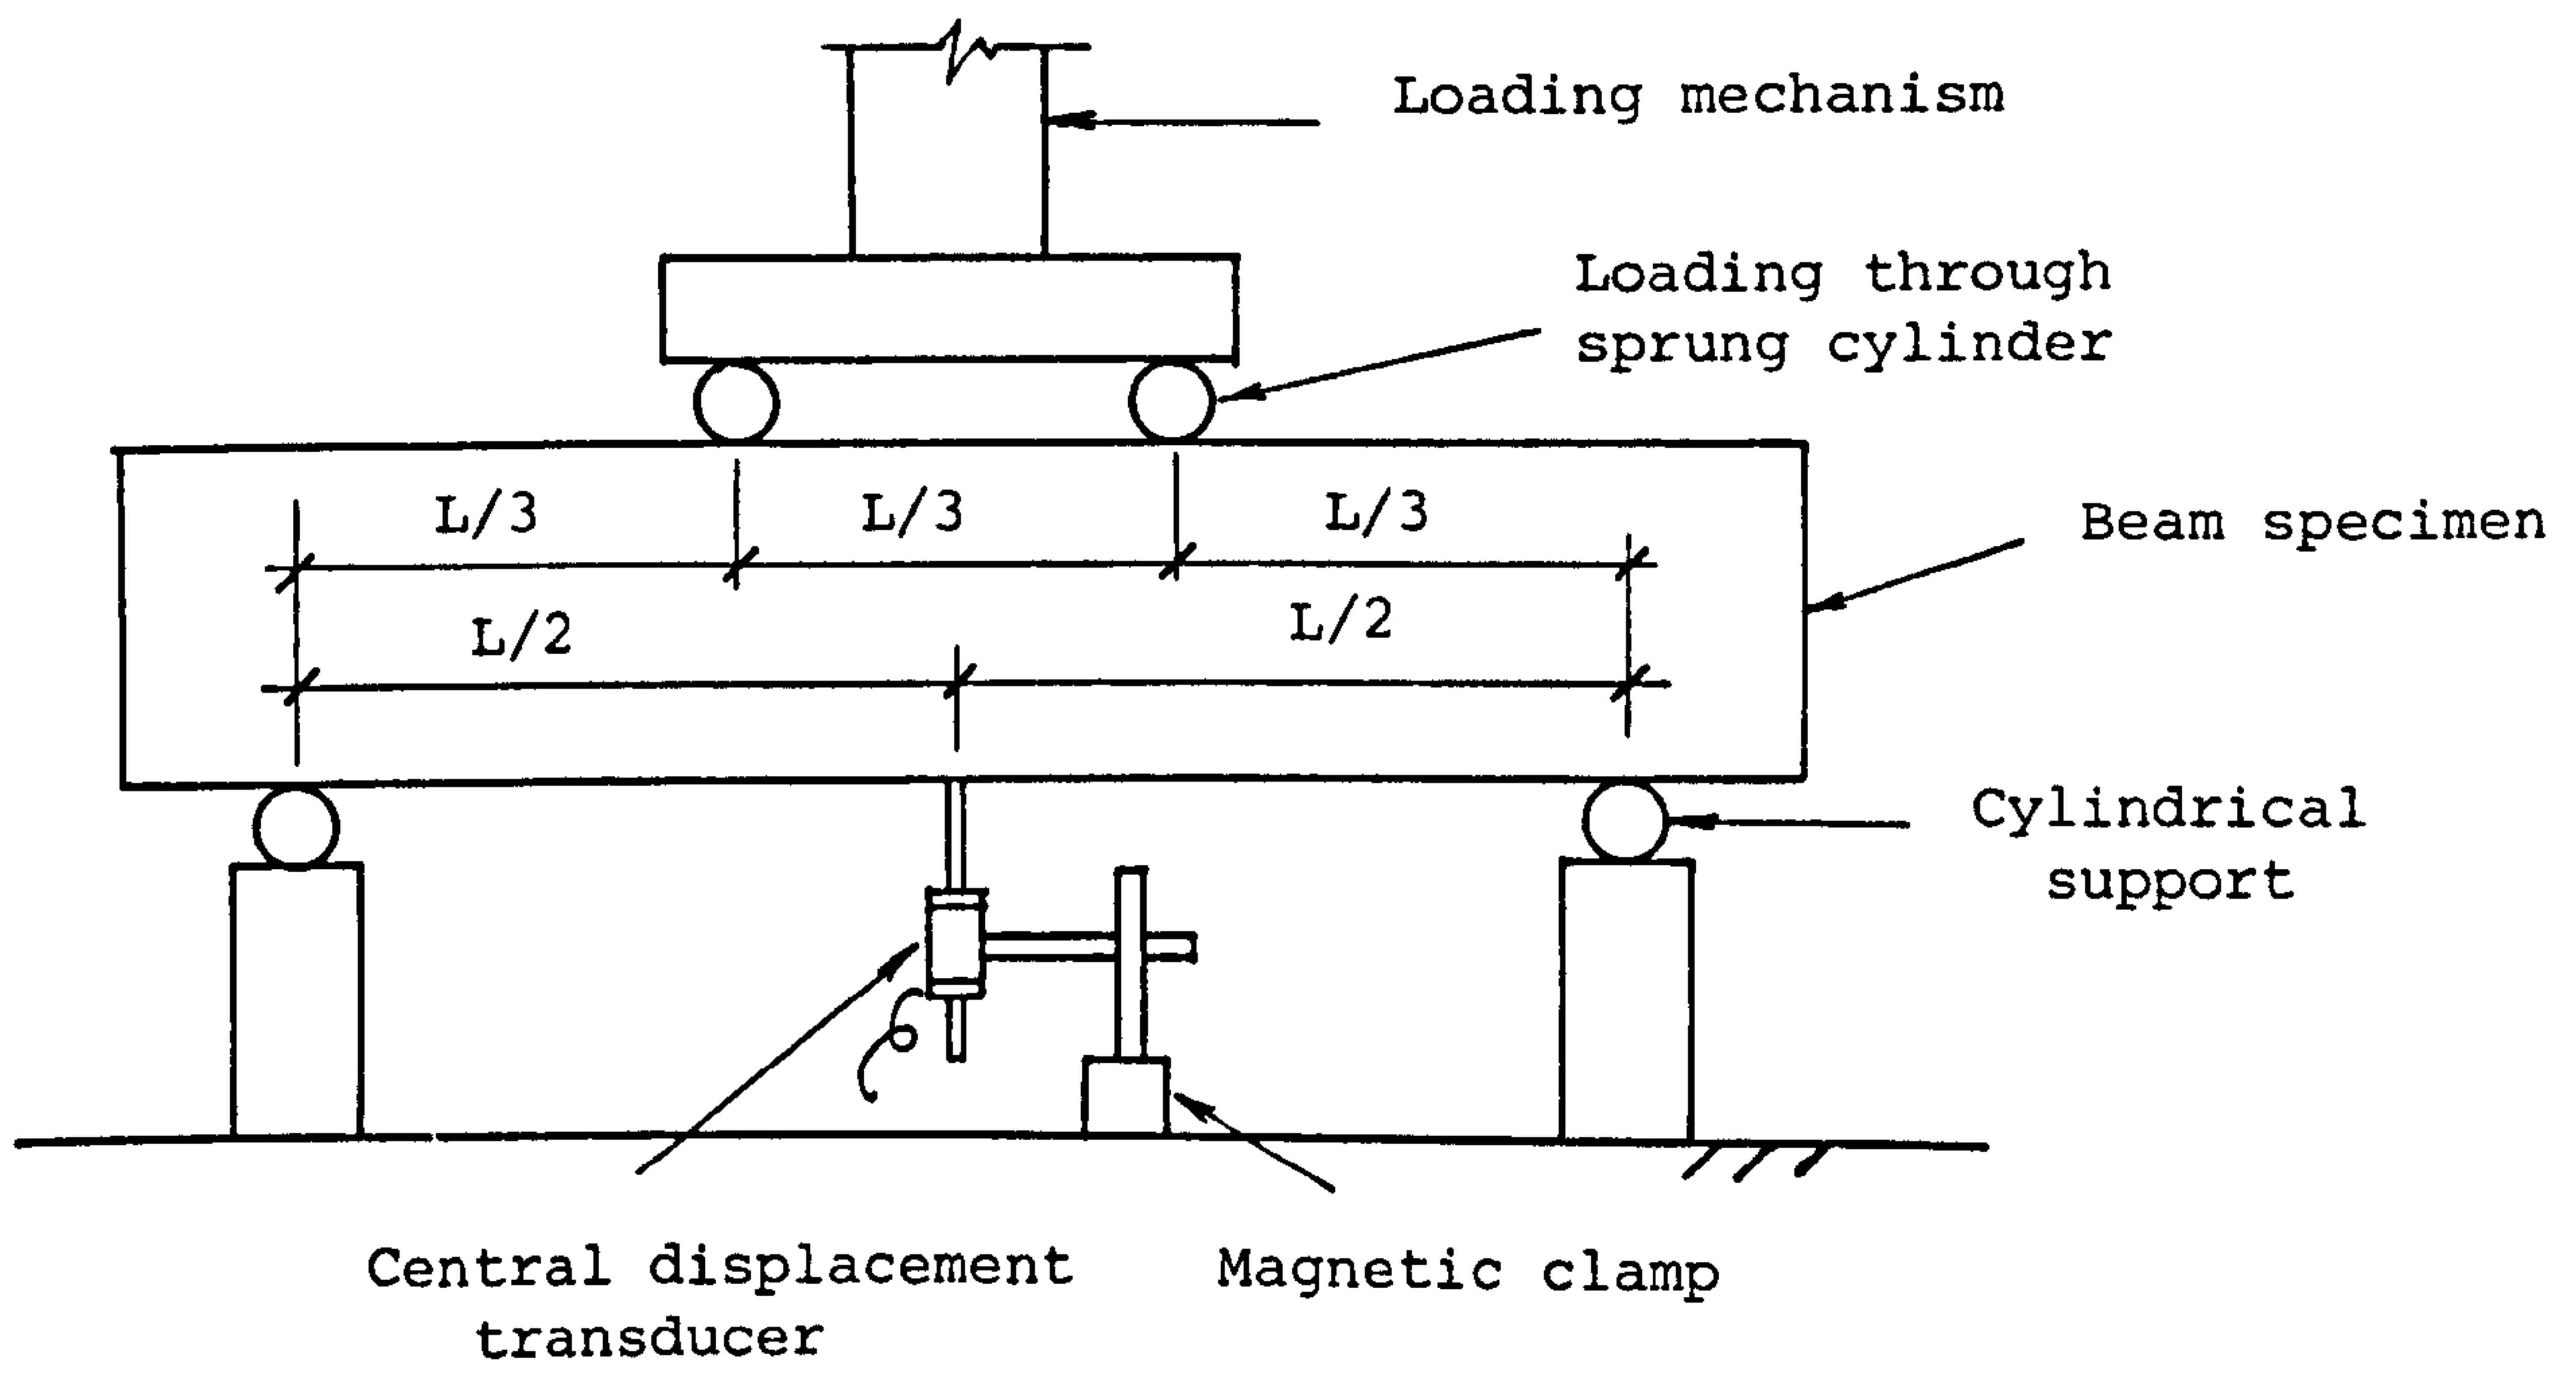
ARRANGEMENT OF BEAM BENDING TESTS
